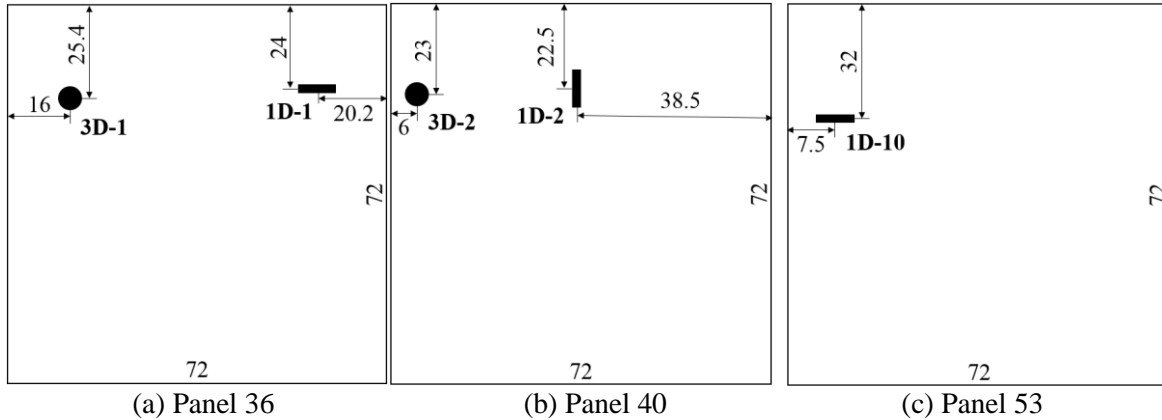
Sensor Layout at the Pavement Panels (Unit: in.)
